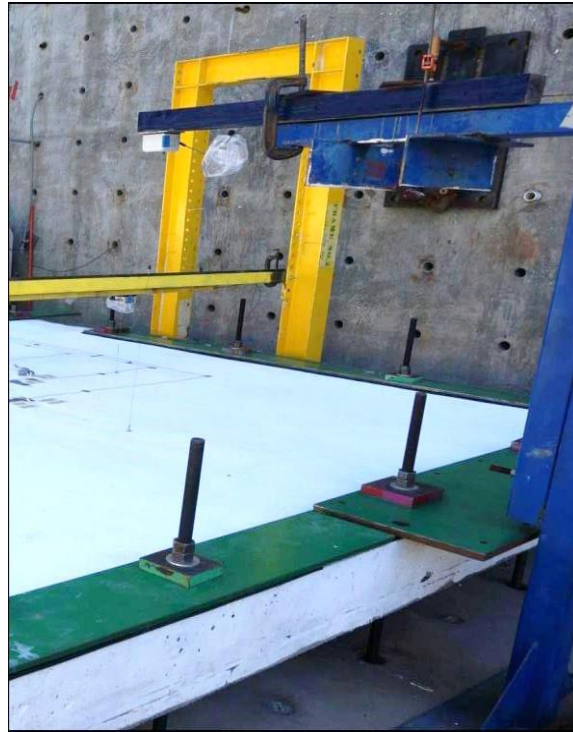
Setup Showing String Potentiometer SP4 Mounted on a Cantilever Steel Frame
